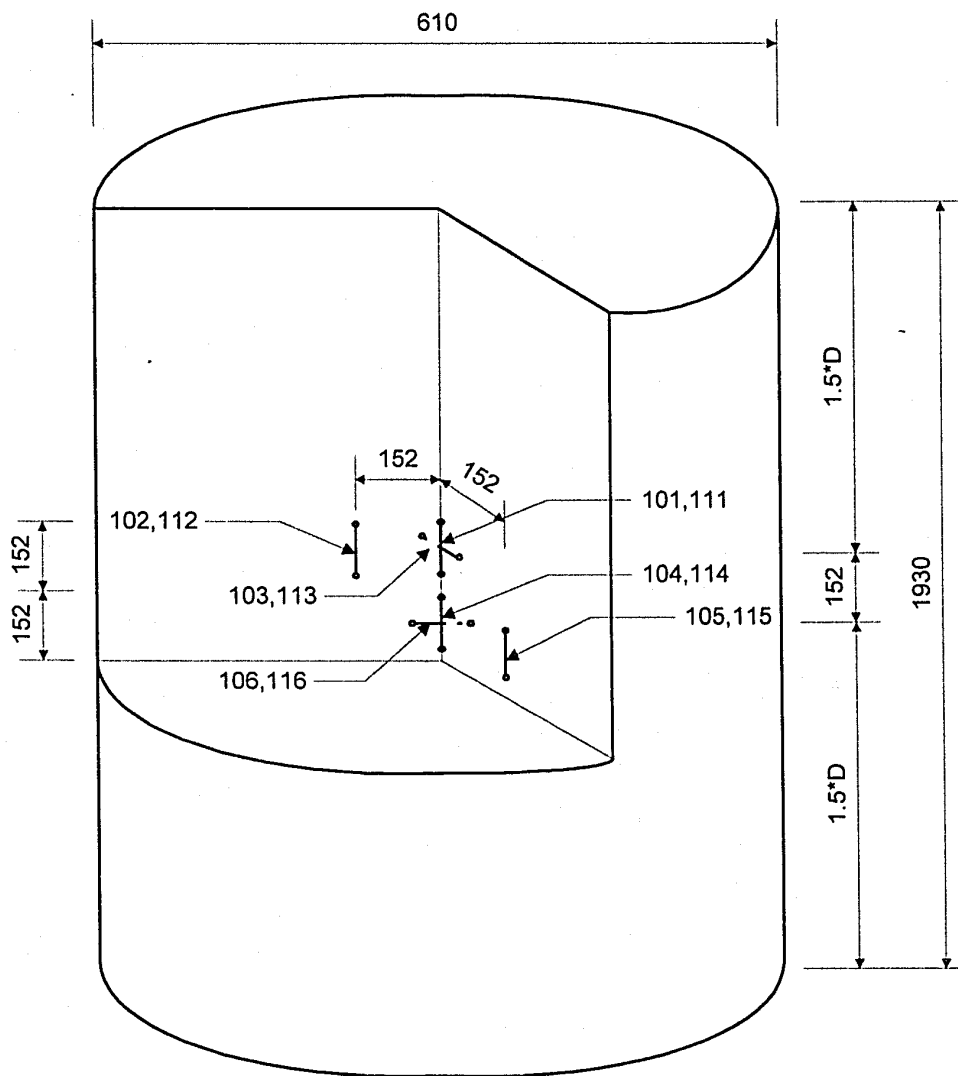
Detail of Strain Gauges Location of 610 mm Diameter Specimens
